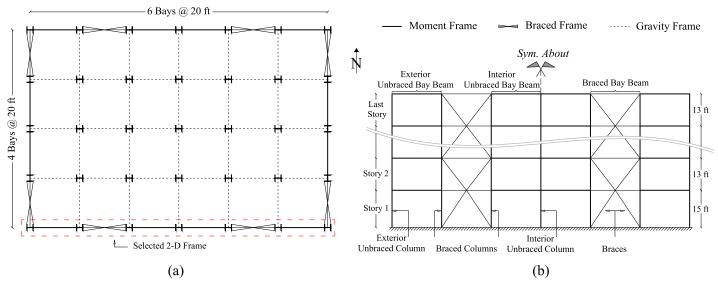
Typical plan and elevation view of building archetypes; a) plan, b) elevation
